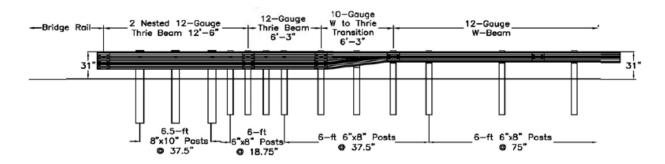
Adapted Simplified Steel-Post Stiffness Transition (Transition to Thrie Beam and Tube Bridge Railing Steel Post Version).
